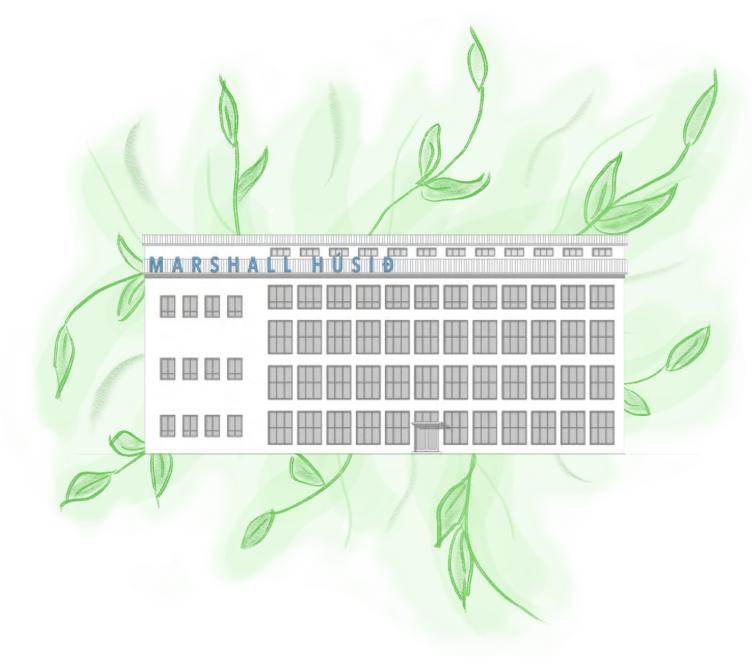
Existing South-East elevation of building exterior with added sketching (Iceland Magazine 2016a)
